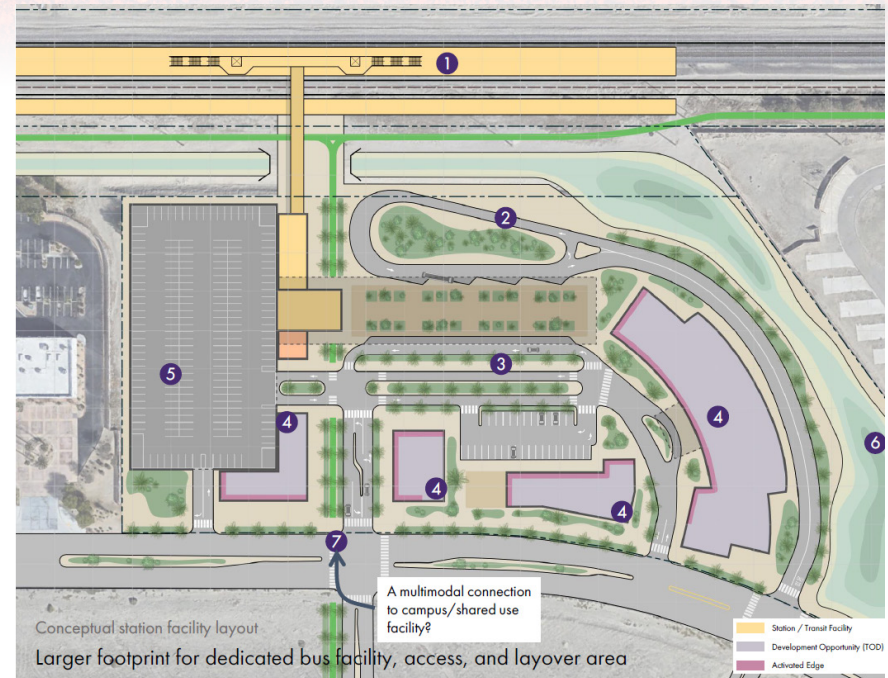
Palm Desert Transit Facility Conceptual Site Plan
